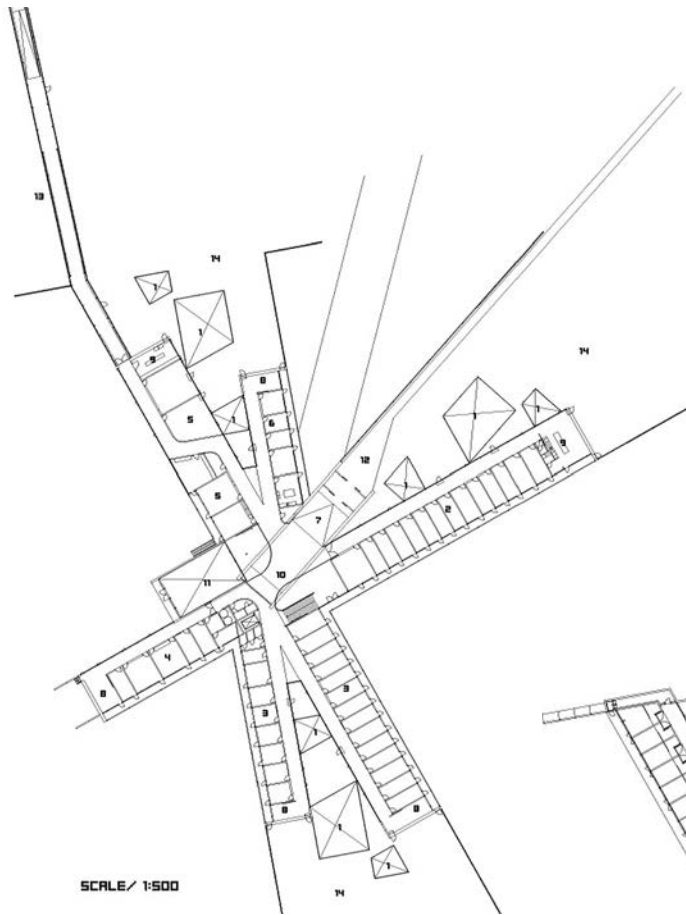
Upper level plan (bridge to hospital top). Source: BIG
